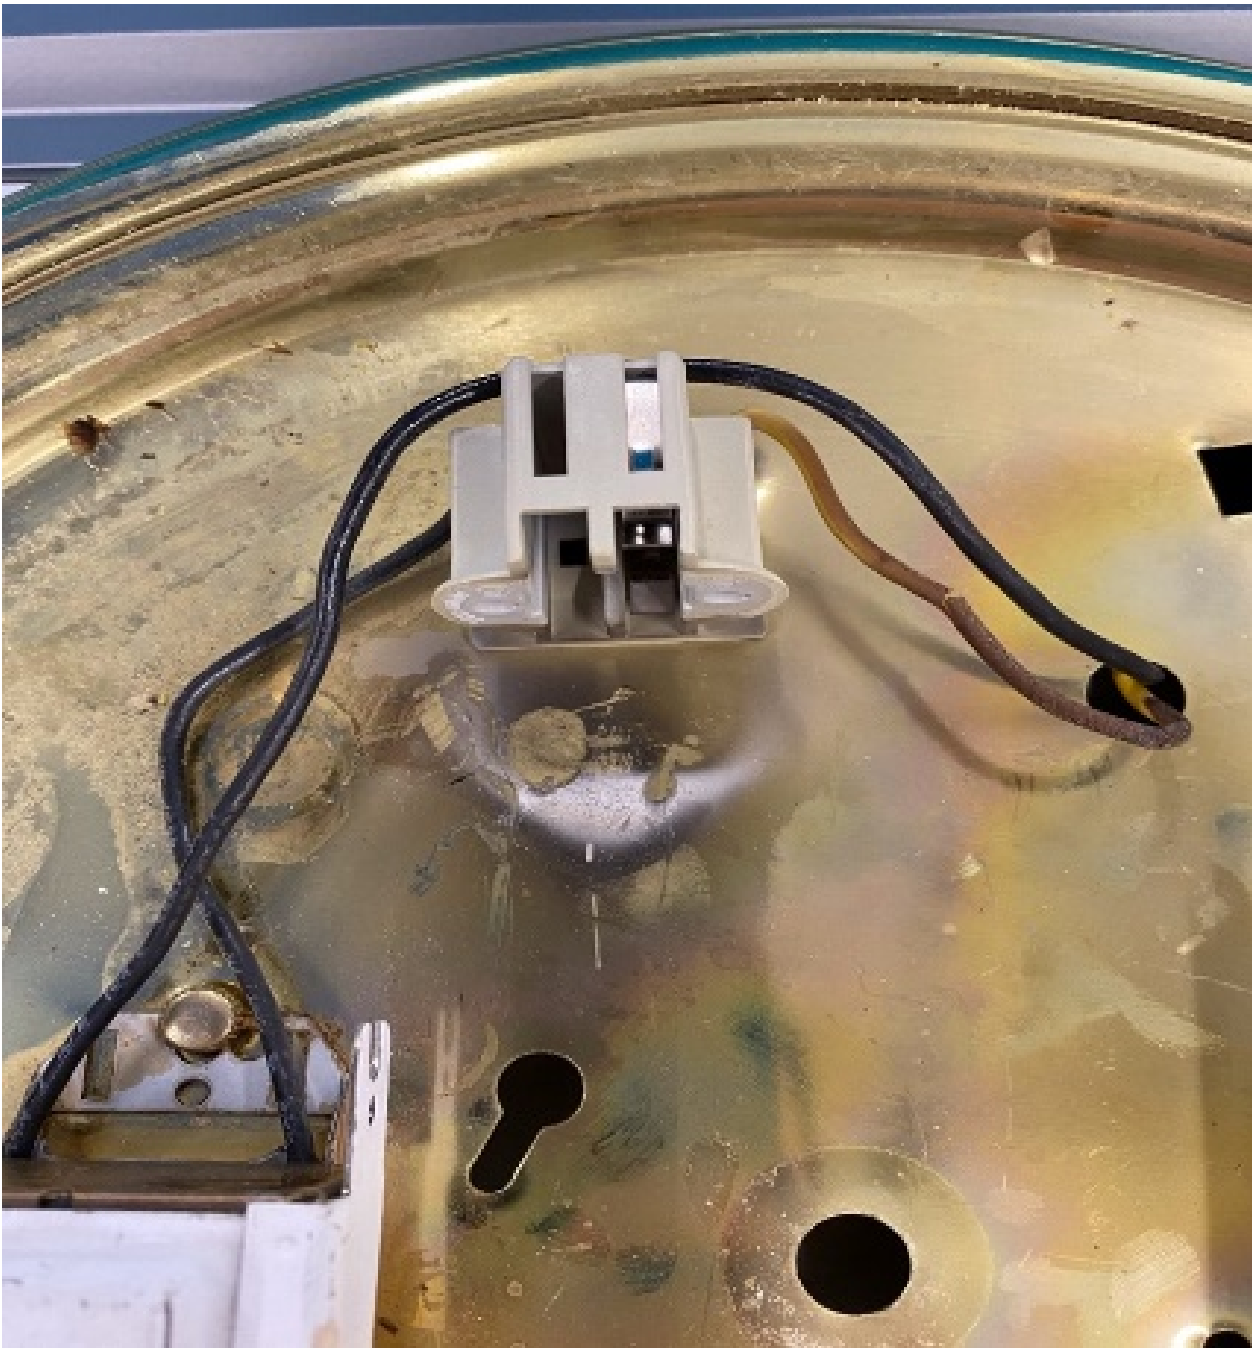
fixture shows discoloration from lamp heat and cracking on white conductor's insulation.
